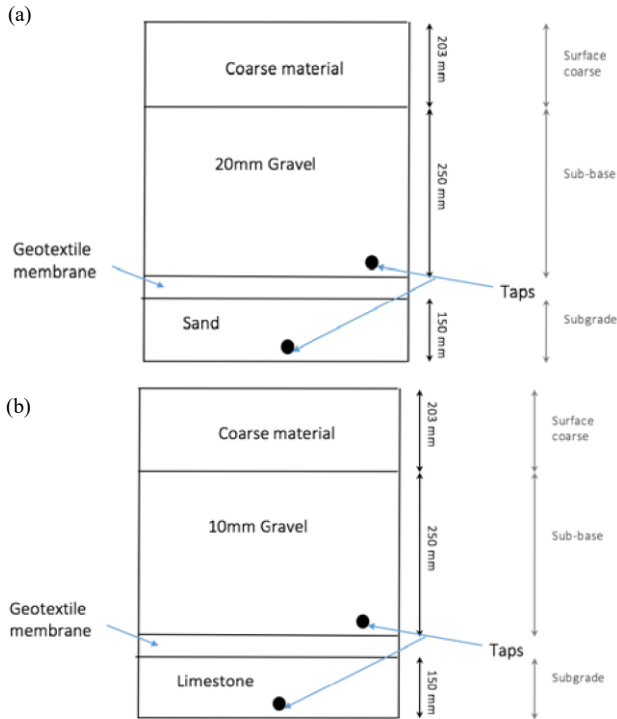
(a) Schematic of Pilot-Scale Permeable Pavement Design-1 (b) Schematic of Pilot-Scale Permeable Pavement Design-2 Source: After BSI (2016)
